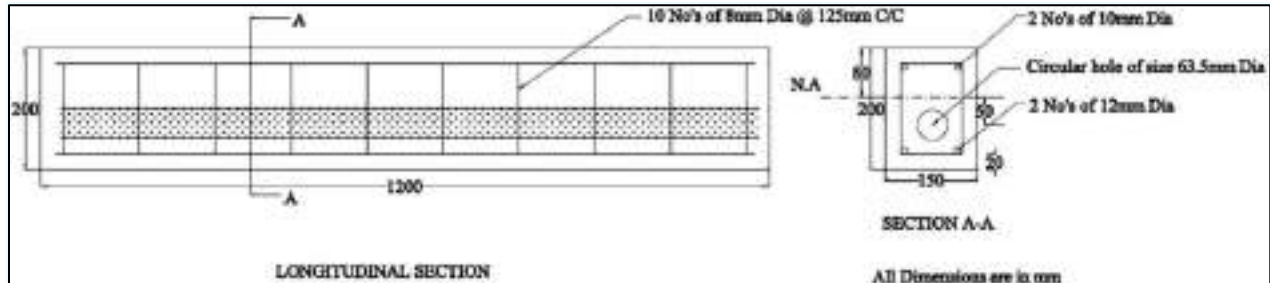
Reinforcement Detail of Hollow Beam with Single Opening.
